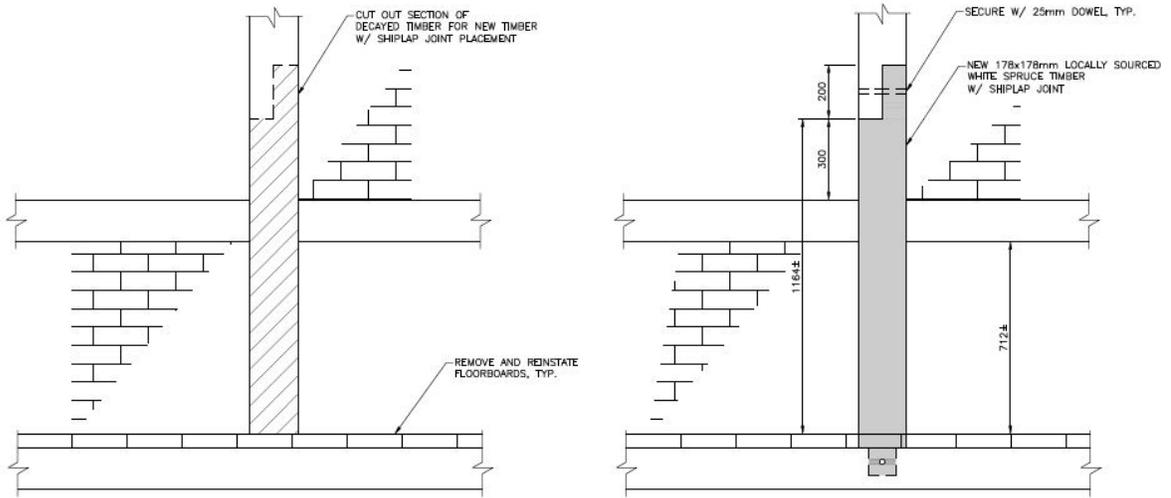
DETAIL: NEW TIMBER W/ SCARF JOINT ON EACH END
